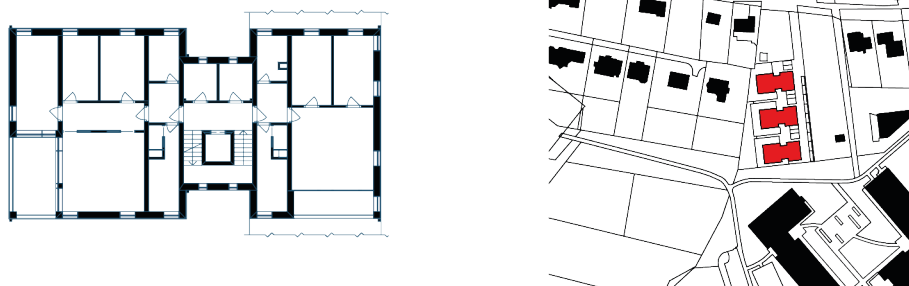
Apartment house Ostravska brana – floorplan and urban situation
